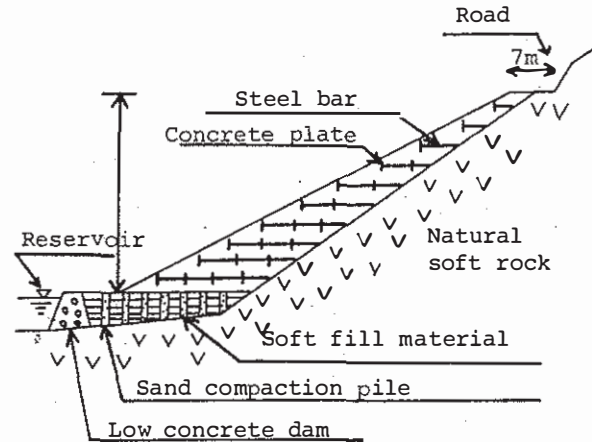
High road embankment reinforced by steel bars with concrete plates, 1963
